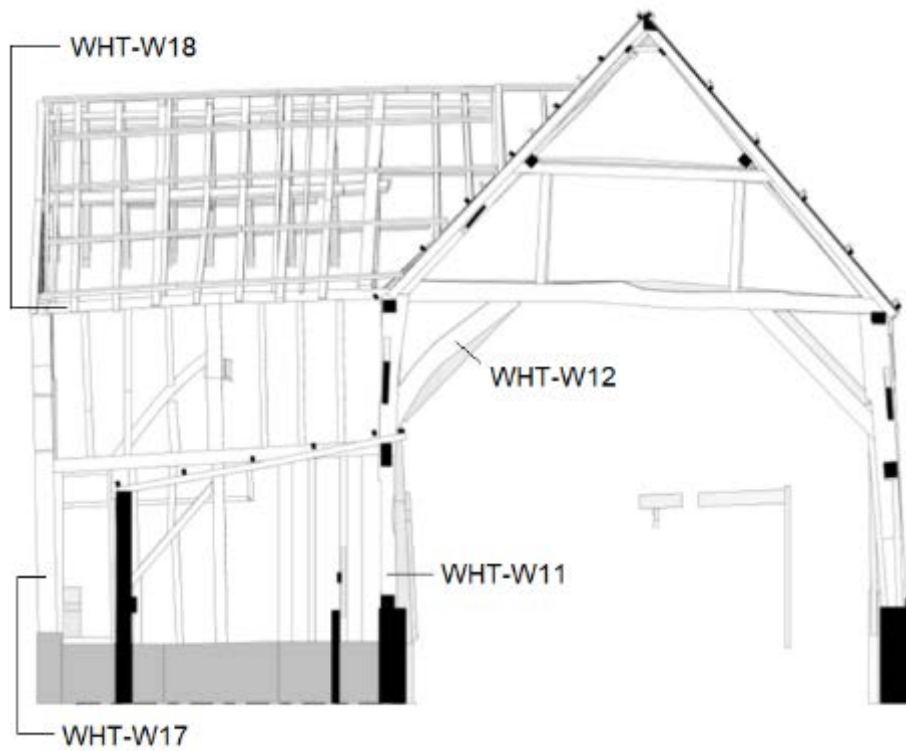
Section through Truss 5, east face, showing the sampled timbers, WHT-W11-12 and WHT-W17-18 (after ATD London Ltd)
